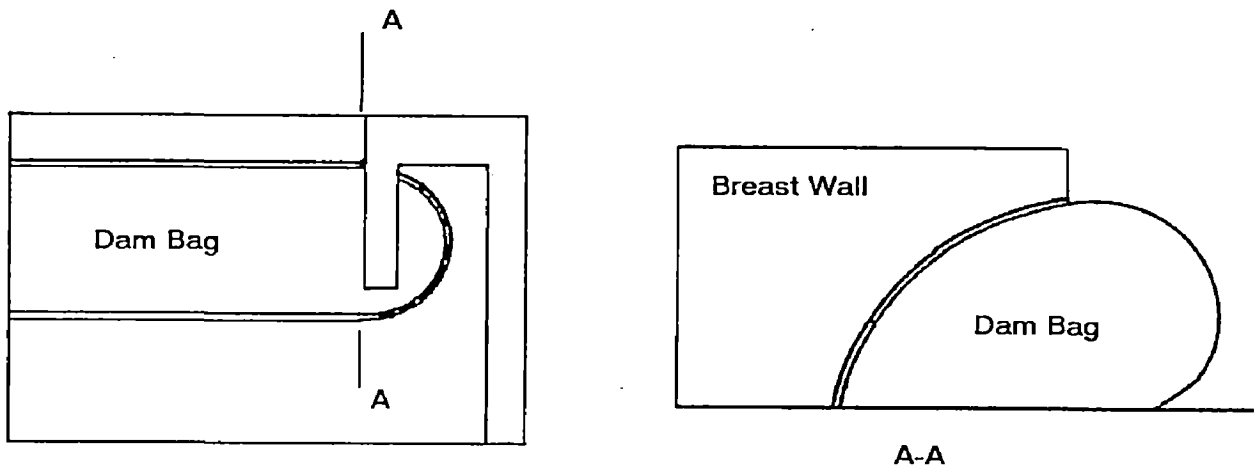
SHOWING LOCATION OF BREAST WALL
